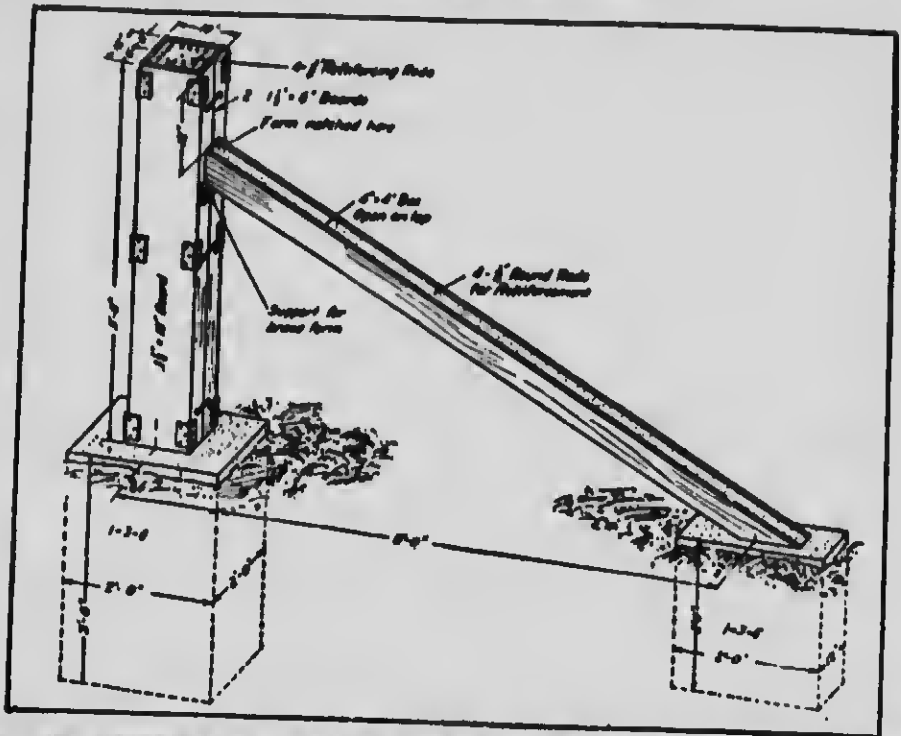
The construction of a Mould for Concrete Corner or End Post with Concrete Brace in place. This Mould can be taken down and used elsewhere.
